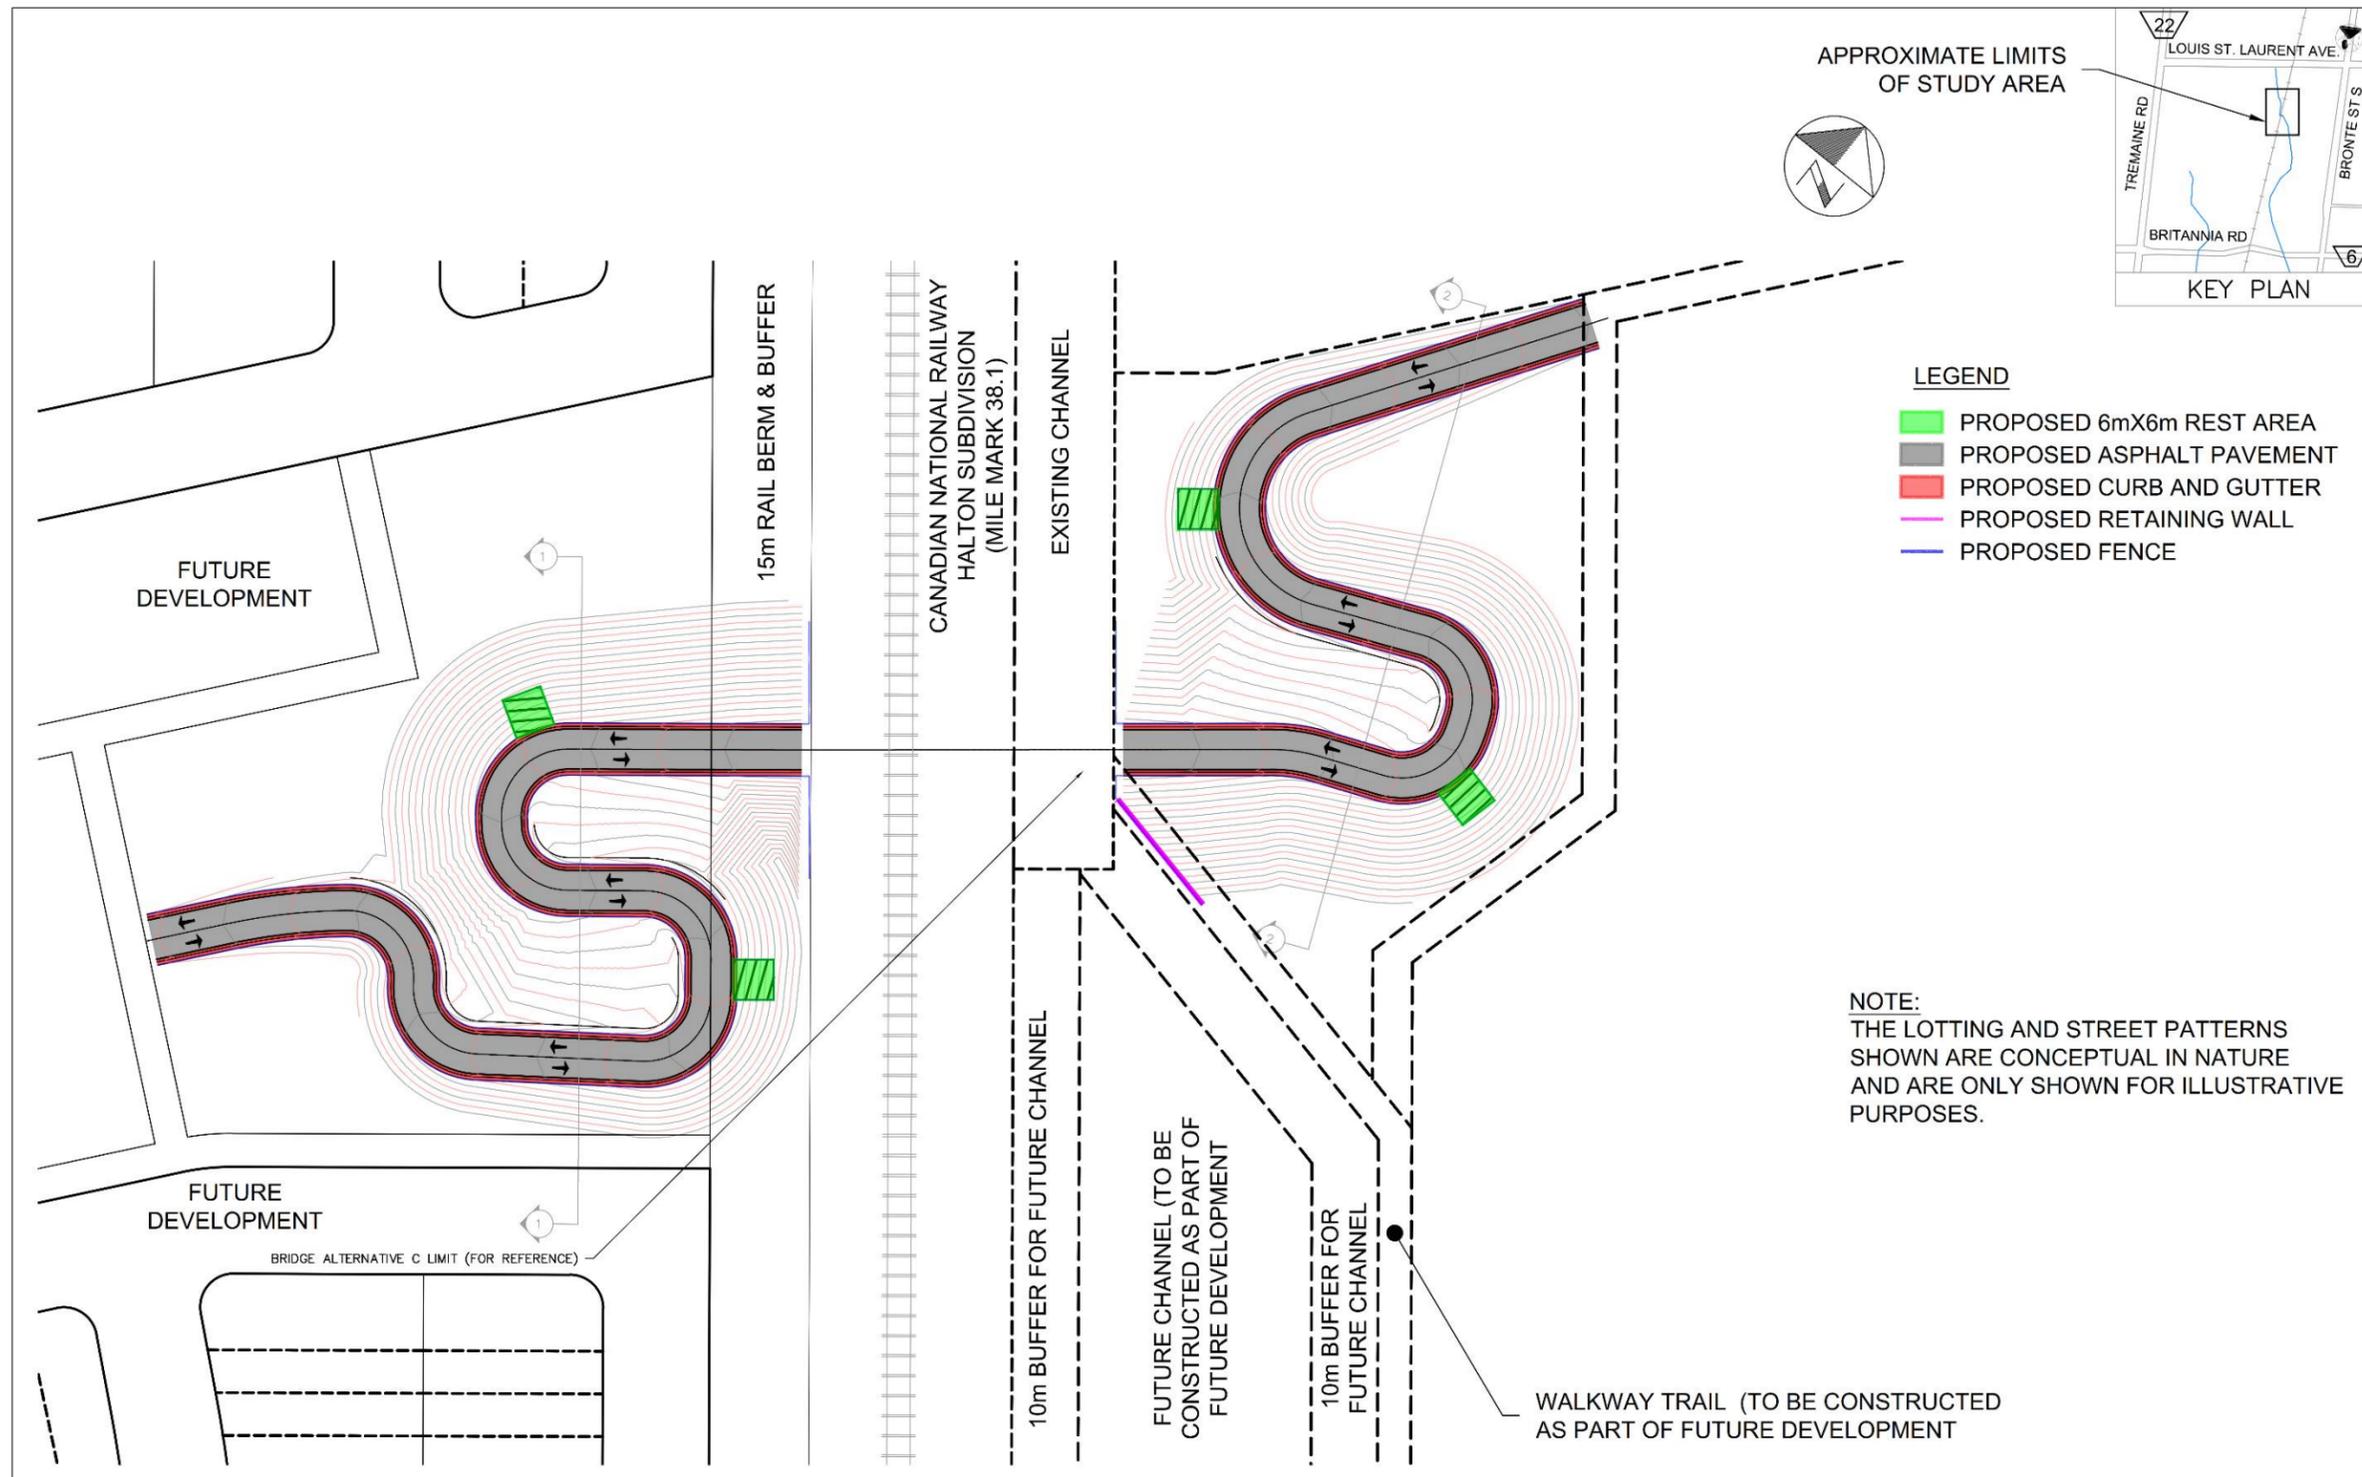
Bridge Approach Alternative 3 - Undulating Approach
